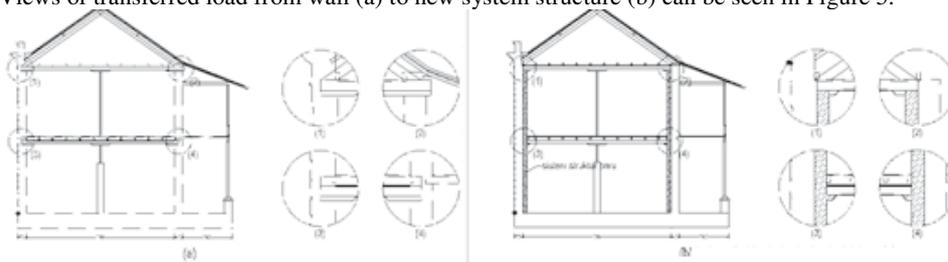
Transferring Load. a) Load from the truss and floor 2 beam is directly supported by the wall. b) Load from the truss and floor 2 beam is directly supported by the new structure in the building interior.
